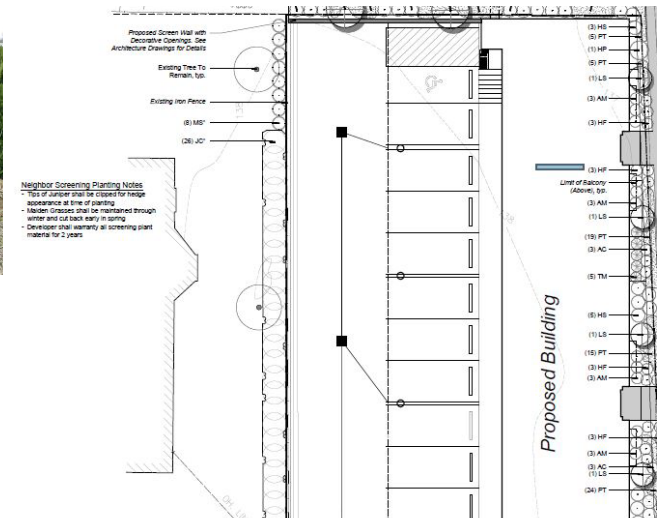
Showing proposed Site Plan with location of screen planting between 104 and 112 Edmund.
